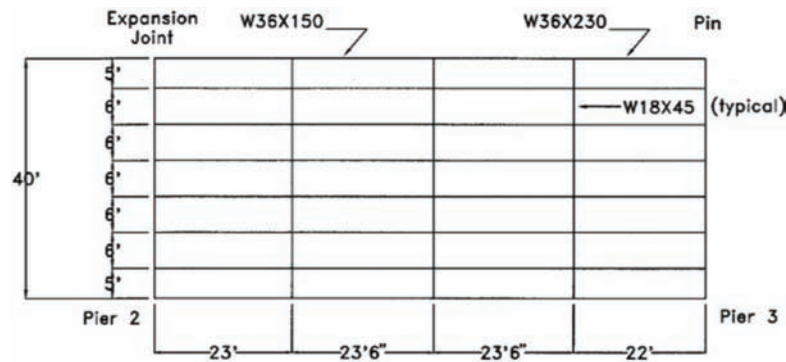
Plan view of US 52 bridge. (Source Wood et al., 2007.)
